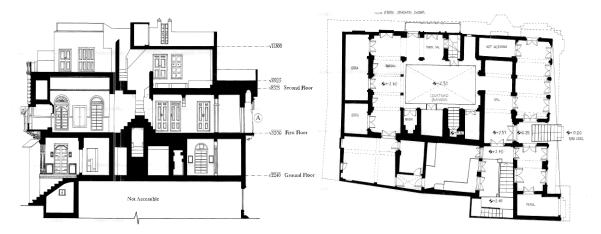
Ground floor plan and section of the Kothari Haveli at Bikaner
